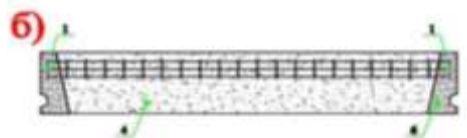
400⁰ C and above it a precast precast concrete structure.
